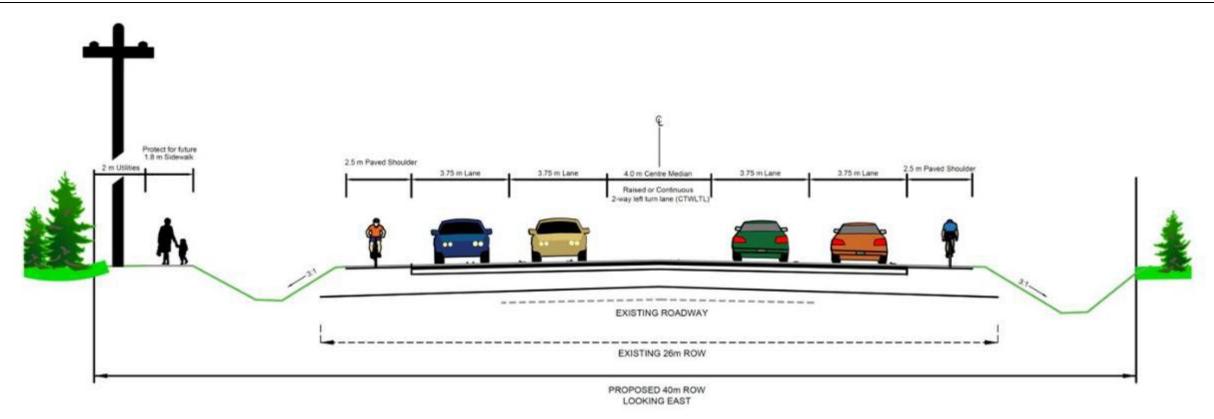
Section 2 (Concession Road 9 easterly) Recommended Cross Section
